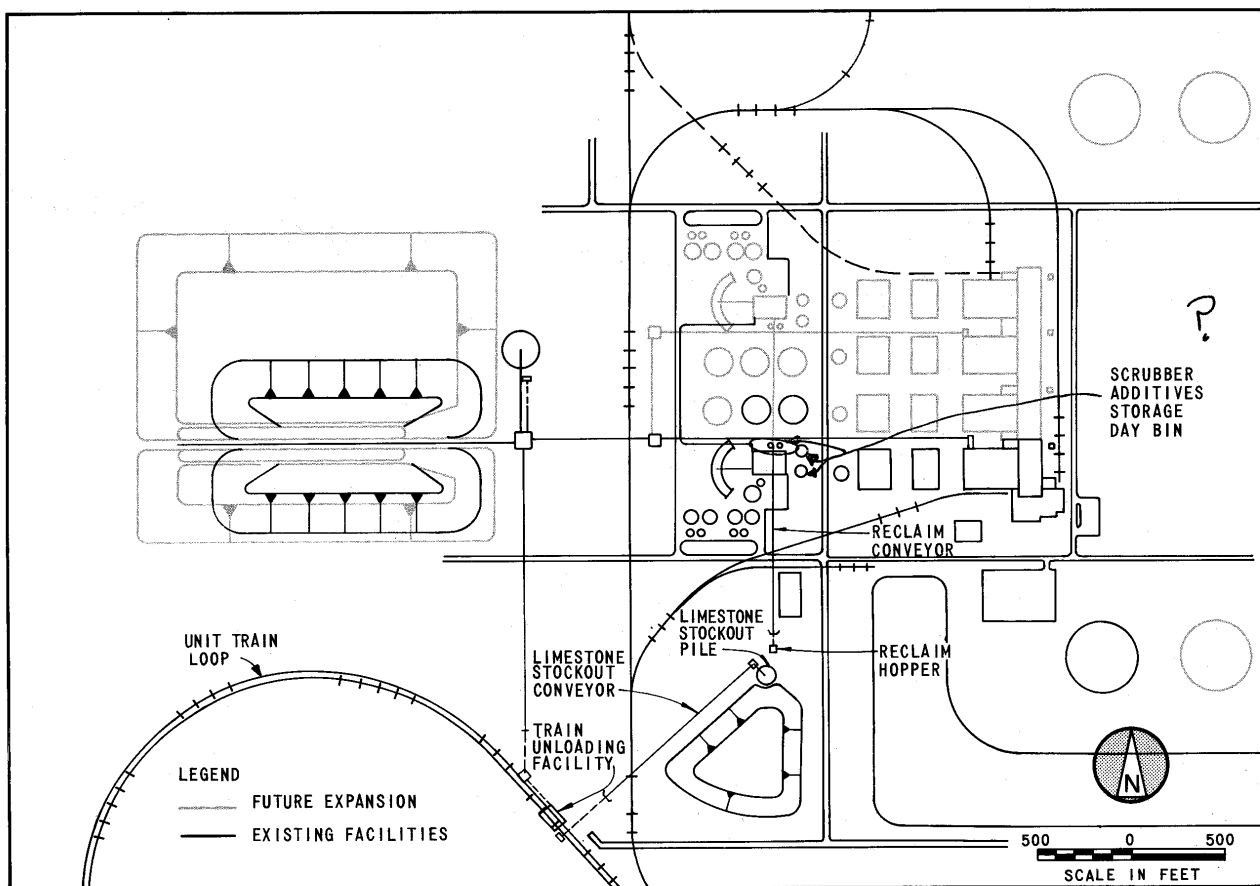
SCRUBBER ADDITIVE HANDLING SYSTEM LAYOUT
